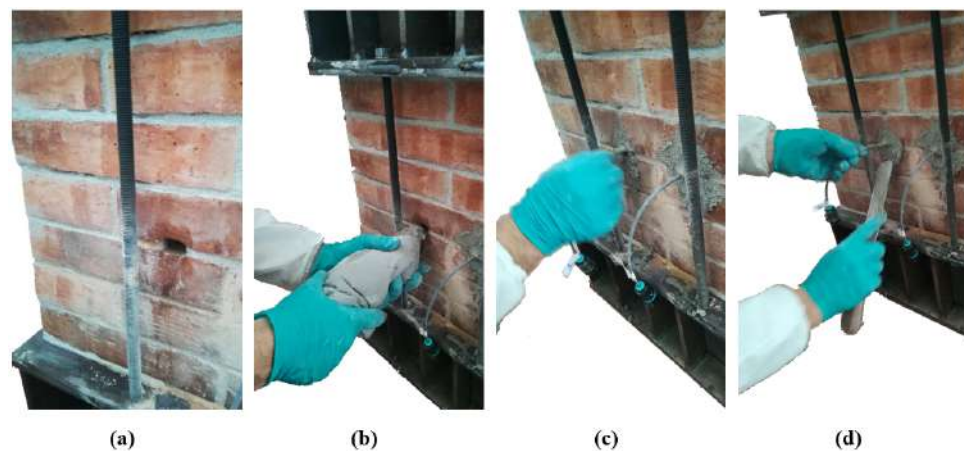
Operating phases for the first post-installation system (P1) of the sensors: (a) hole drilling; (b) hole filling by using mortar; (c) sensor placement; (d) hole sealing.
